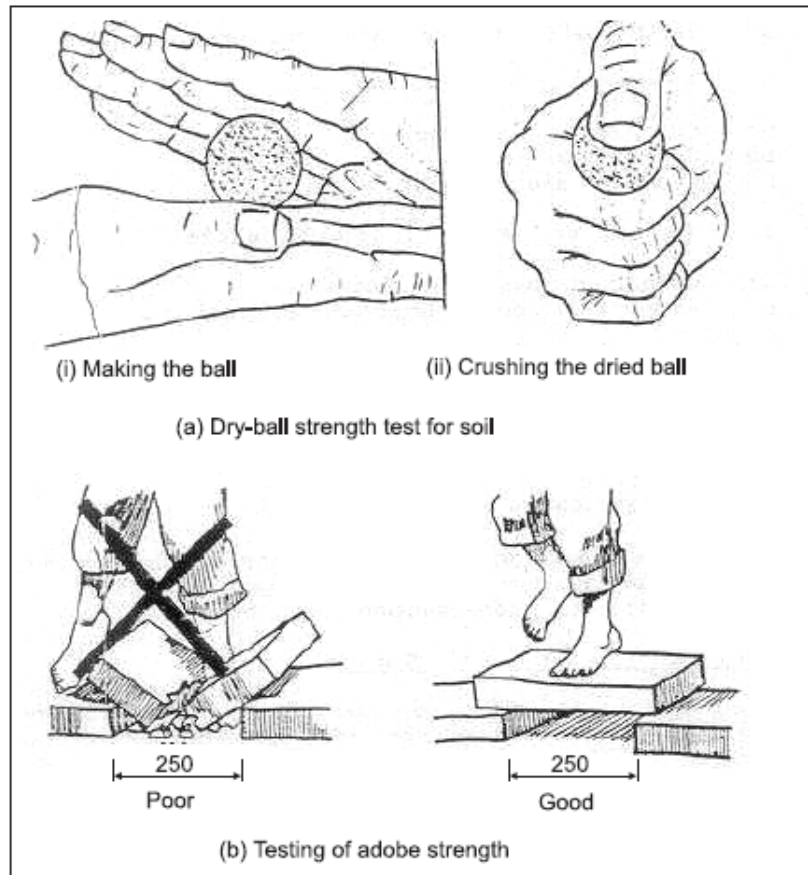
Field strength test of soil (a) and adobe block (b)(IAEE 1986).
